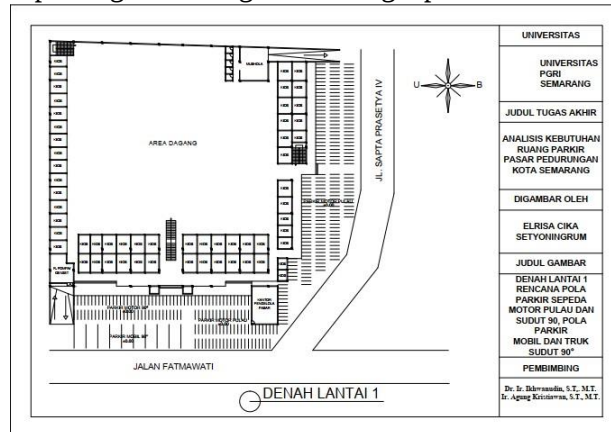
Proposed Parking Pattern Layout of the First Floor
